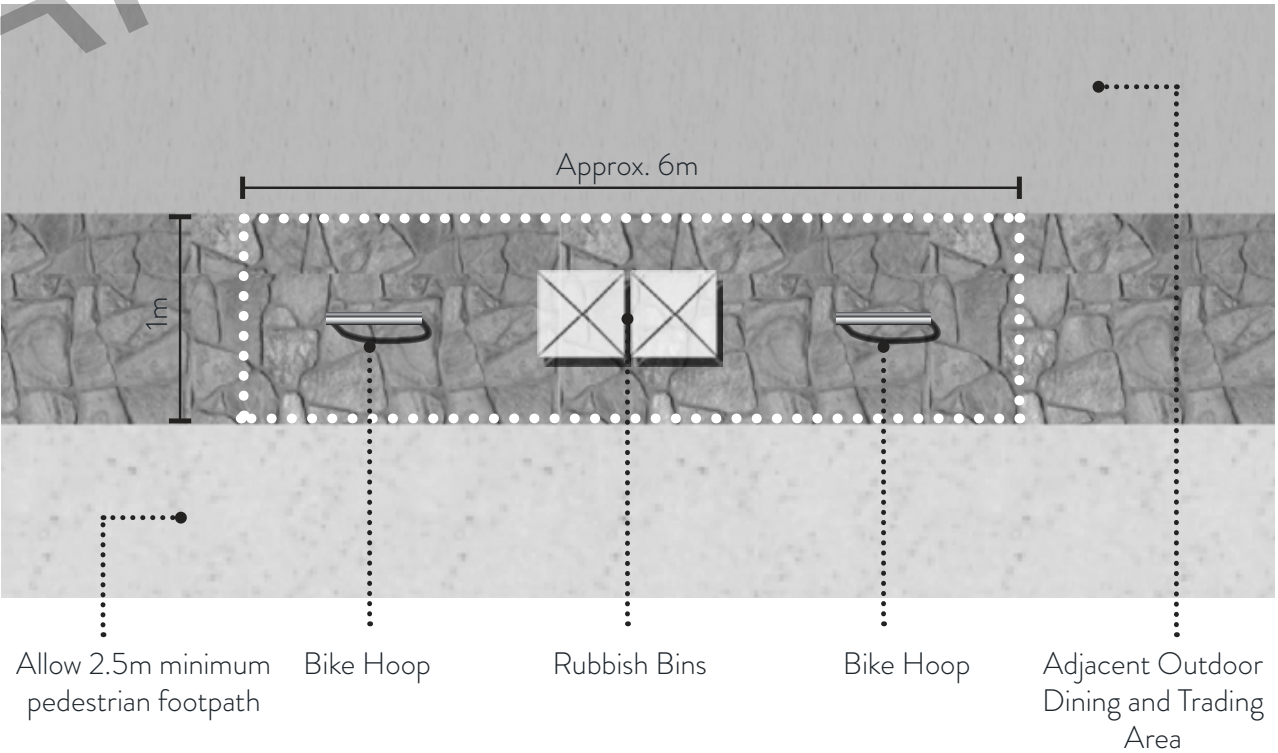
Furniture Arrangement Type 1 - Bike Hoops and Bins within the service area of the road cross section.
